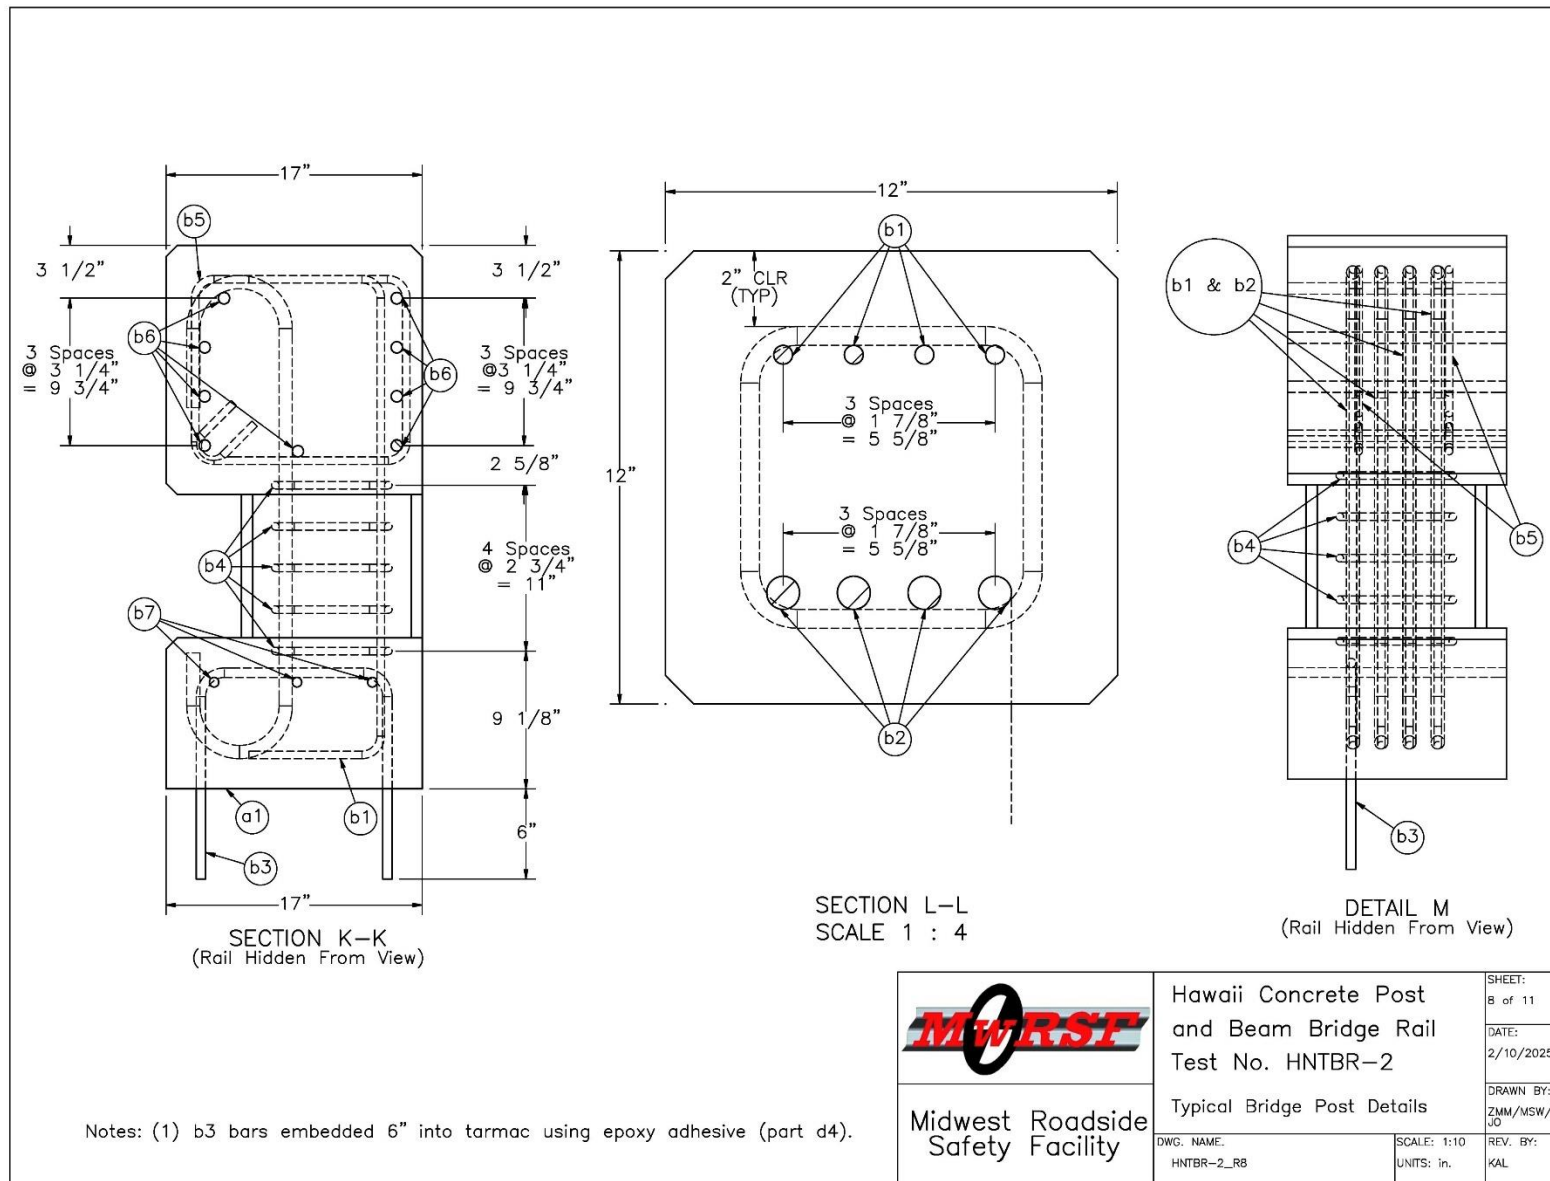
Post-Rail Rebar Arrangement, Test Nos. HNTBR-2 and HNTBR-3
